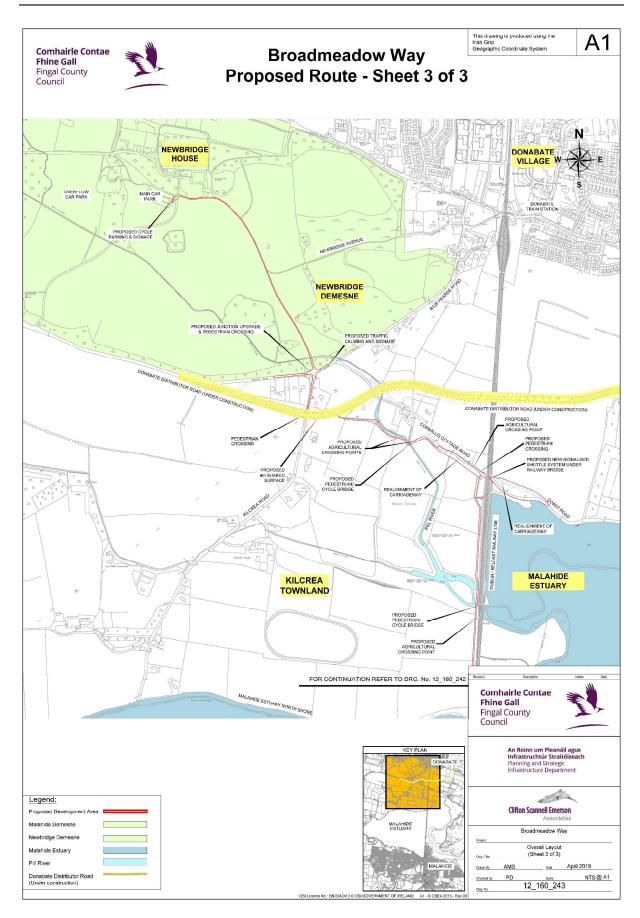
Site Location and General Site Setting - Sheet 3 of 3.
